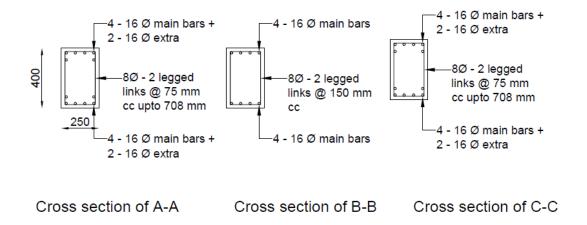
Cross sections of beams from ground floor to 2nd floor at different locations
